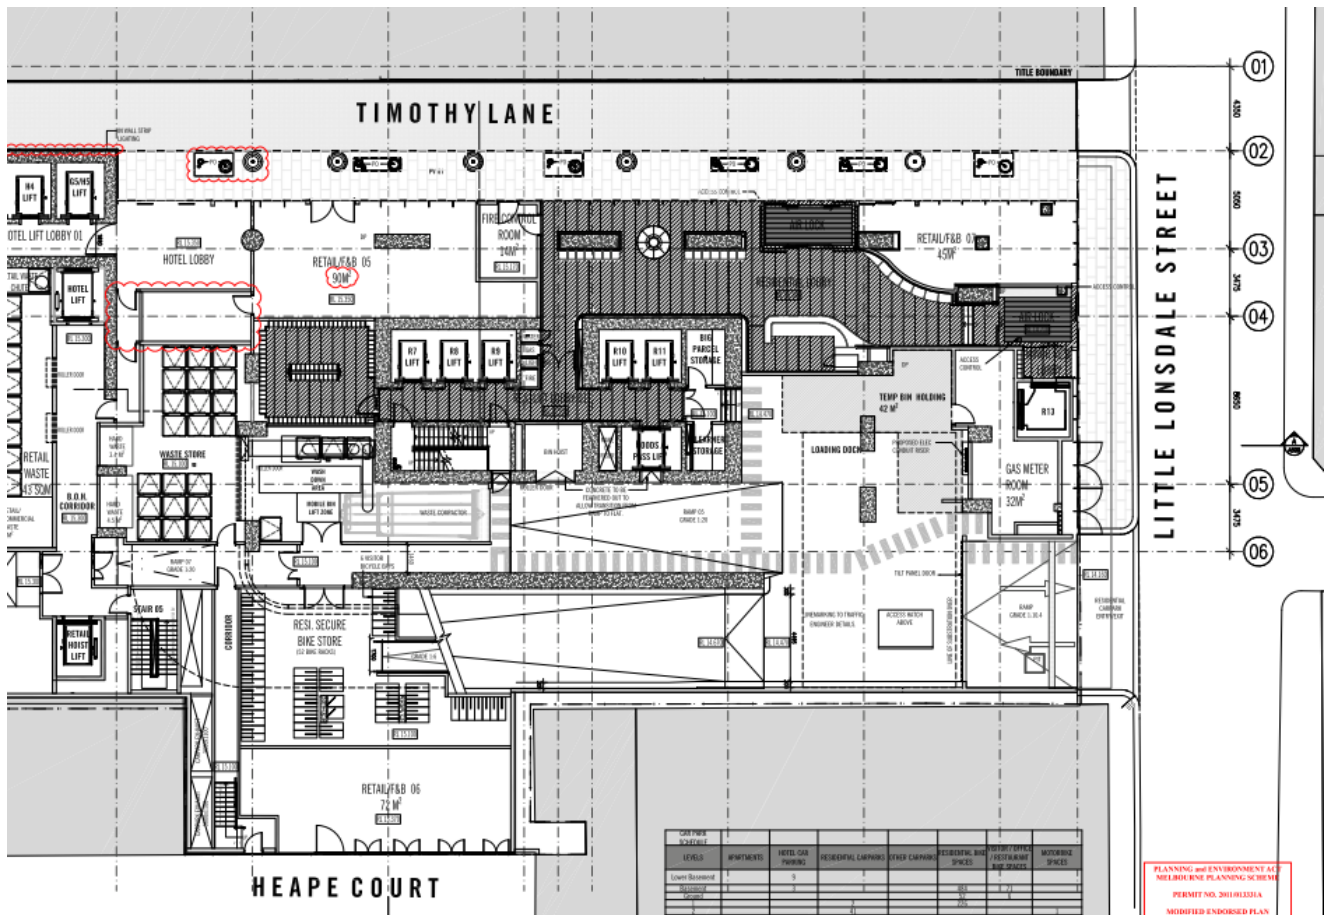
Extract of endorsed ground floor plan showing the approved waste facilities (Source: Elenberg Fraser)
